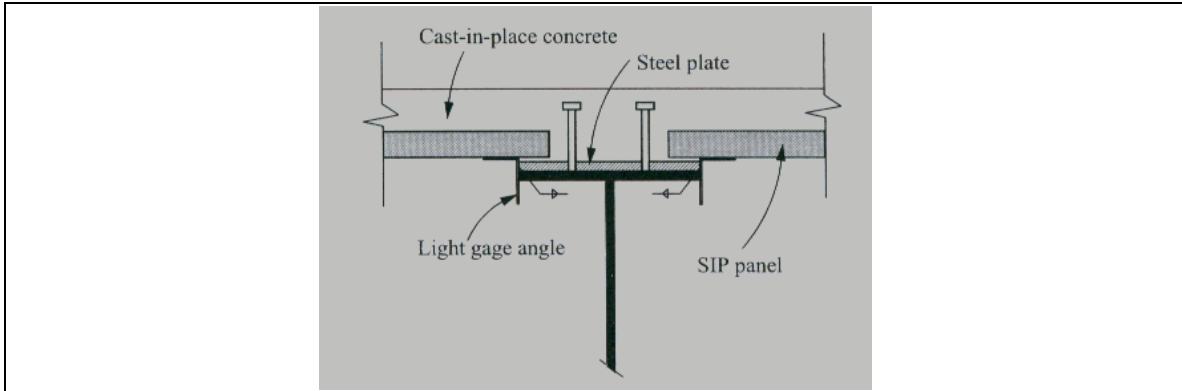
Typical steel girder/deck connection (Tadros and Baishya, 1998)
